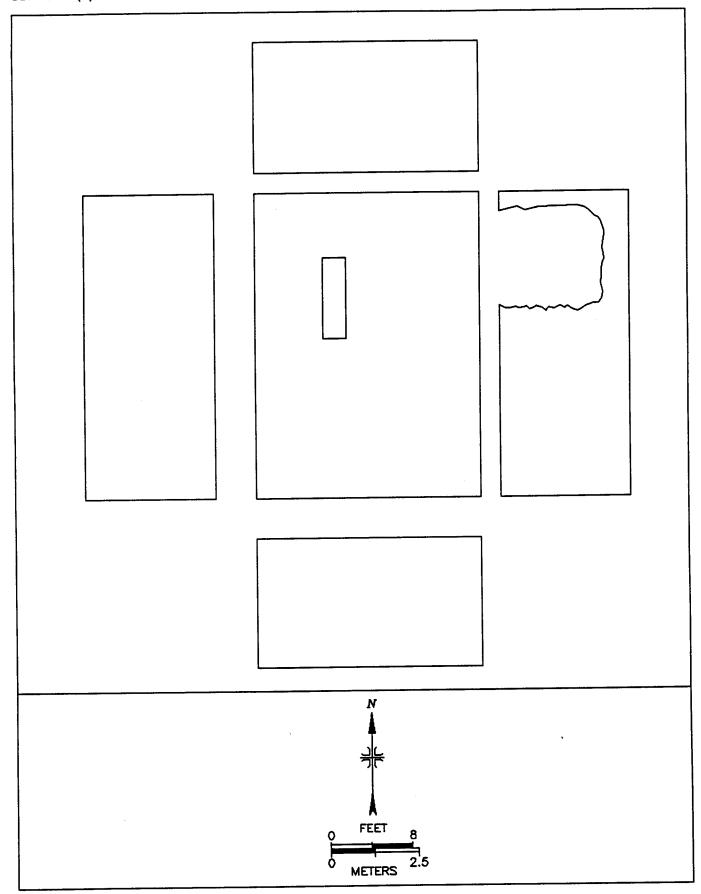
Building 059 Pipe Chase Room — Plot Plan
